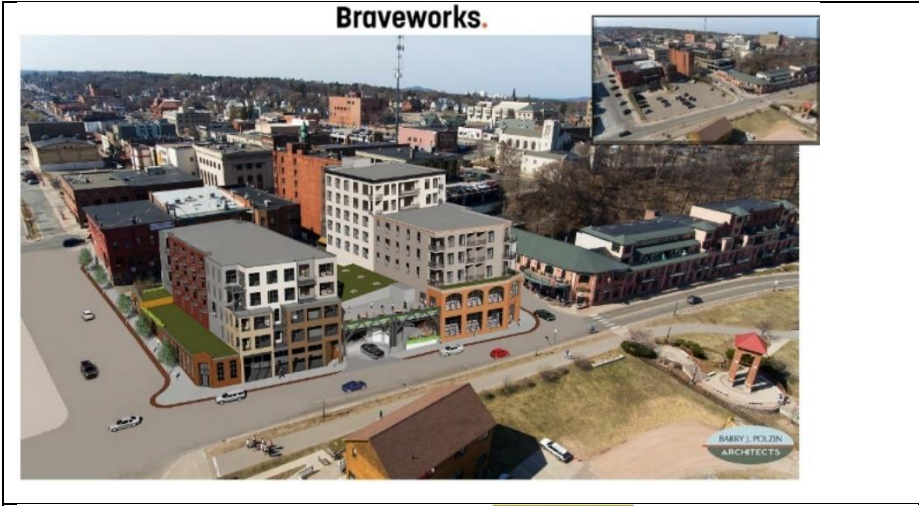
EXHIBIT B: RENDERING OF PUBLIC PARKING FACILITY AND PROJECT
